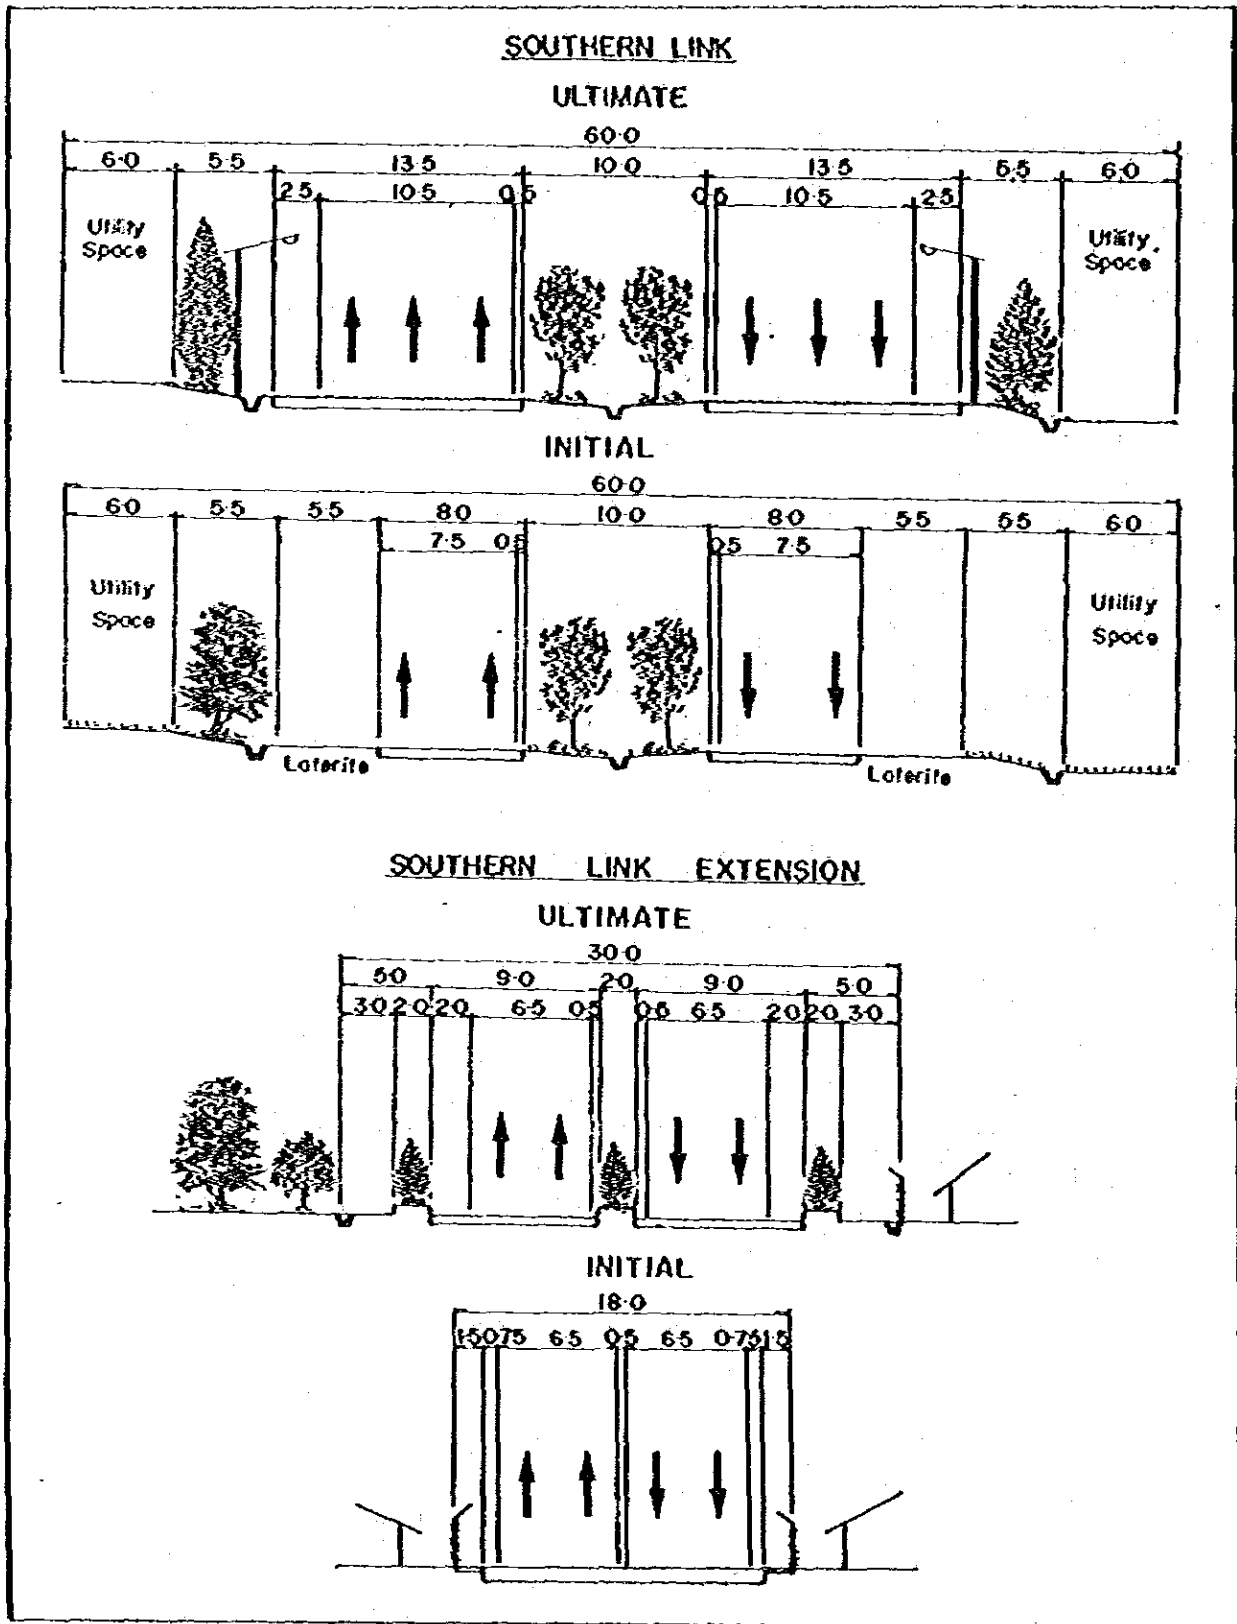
TYPICAL CROSS SECTION: SOUTHERN LINK AND ITS EXTENSION
